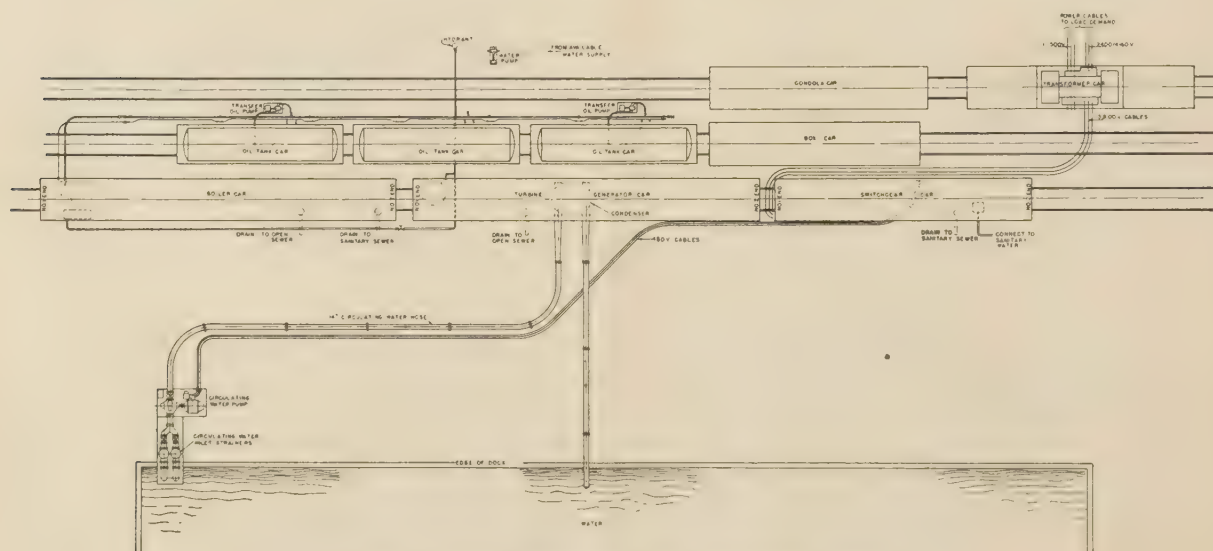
TYPICAL PLAN OF SETUP FOR OPERATION OF PLANT
